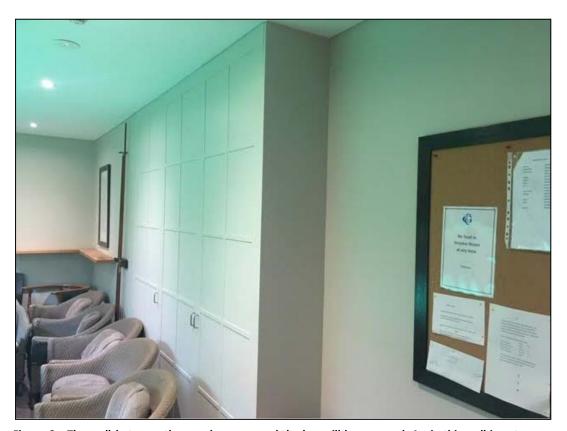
The wall between the snooker room and the bar will be removed. Again this wall is not structural.
